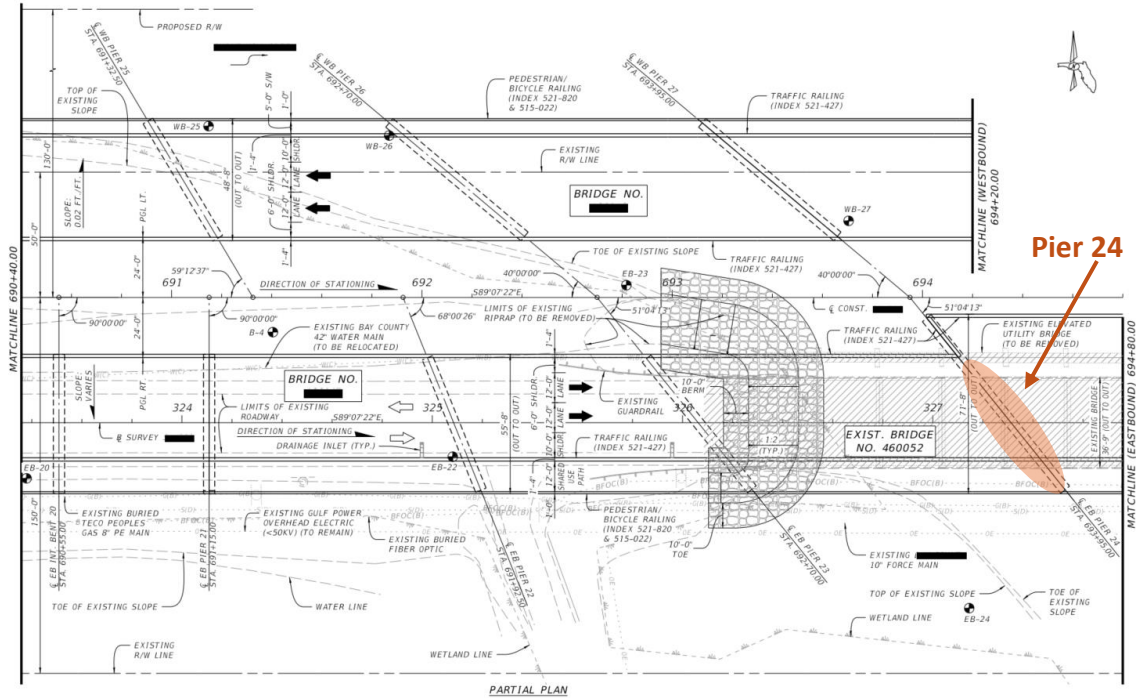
Partial plan – Selected Pier no.24 of the Eastbound Bridge (B1-05)
